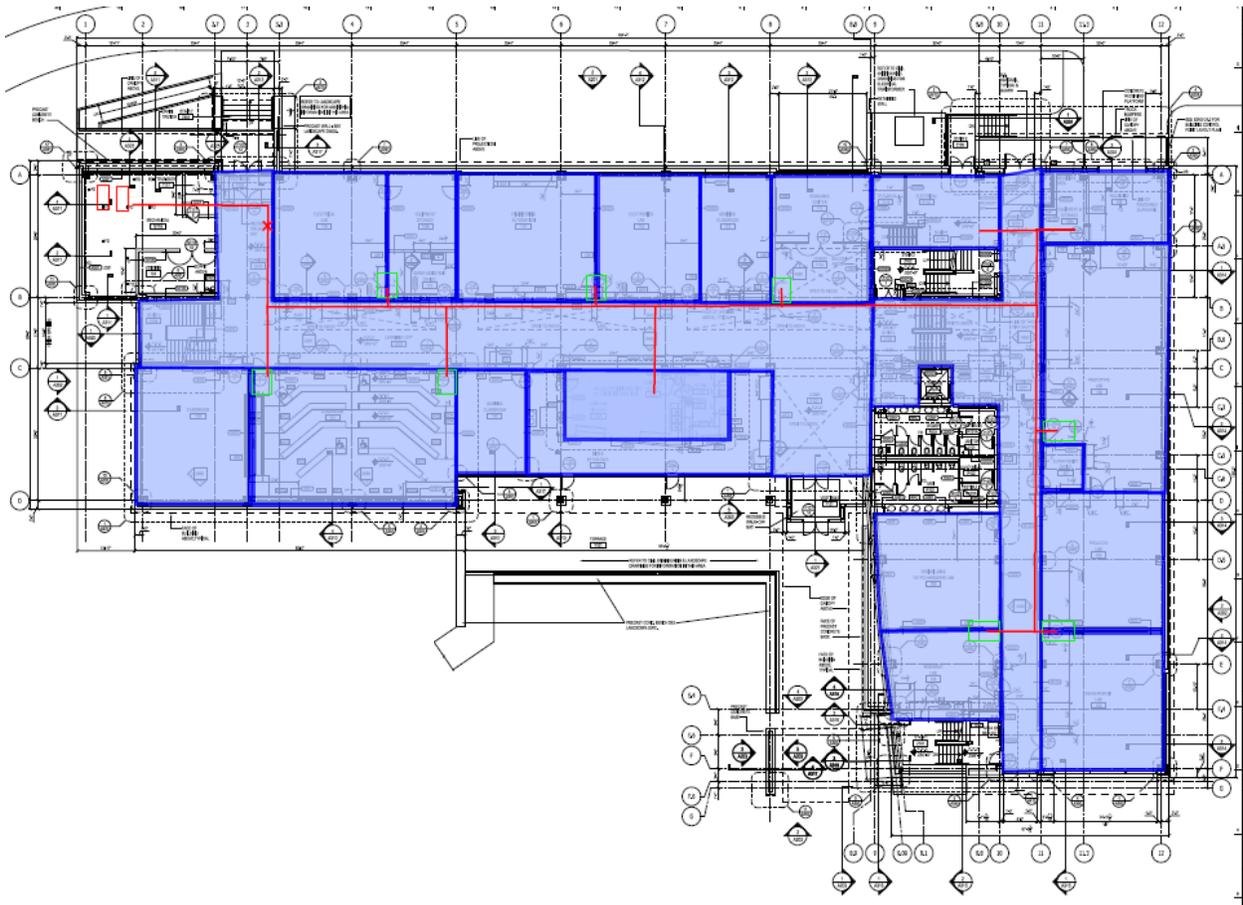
A diagram of the first floor HVAC zoning and piping distribution
